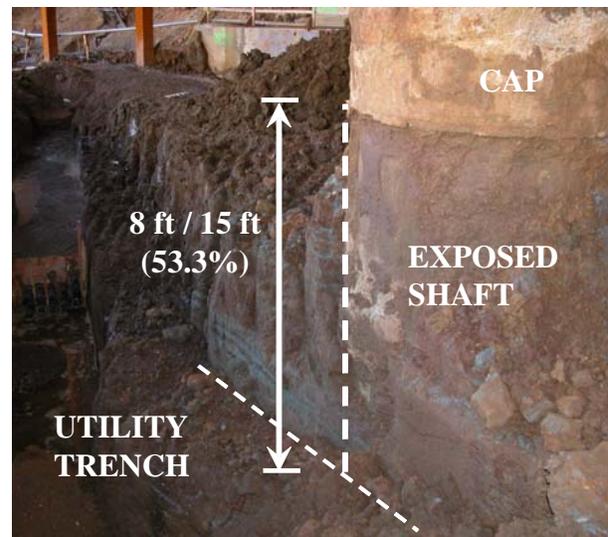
Exposed Drilled Shaft in Northwest Corner of Site
